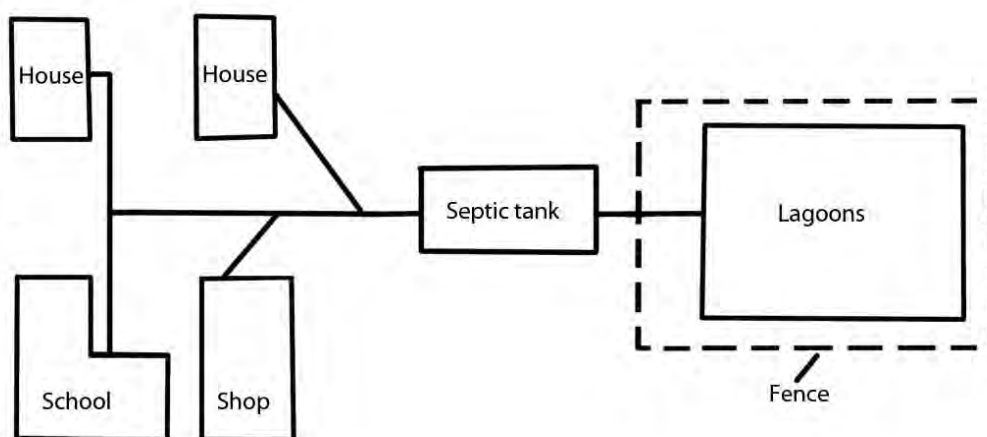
Plan view of a full sewage system with a large septic tank.
